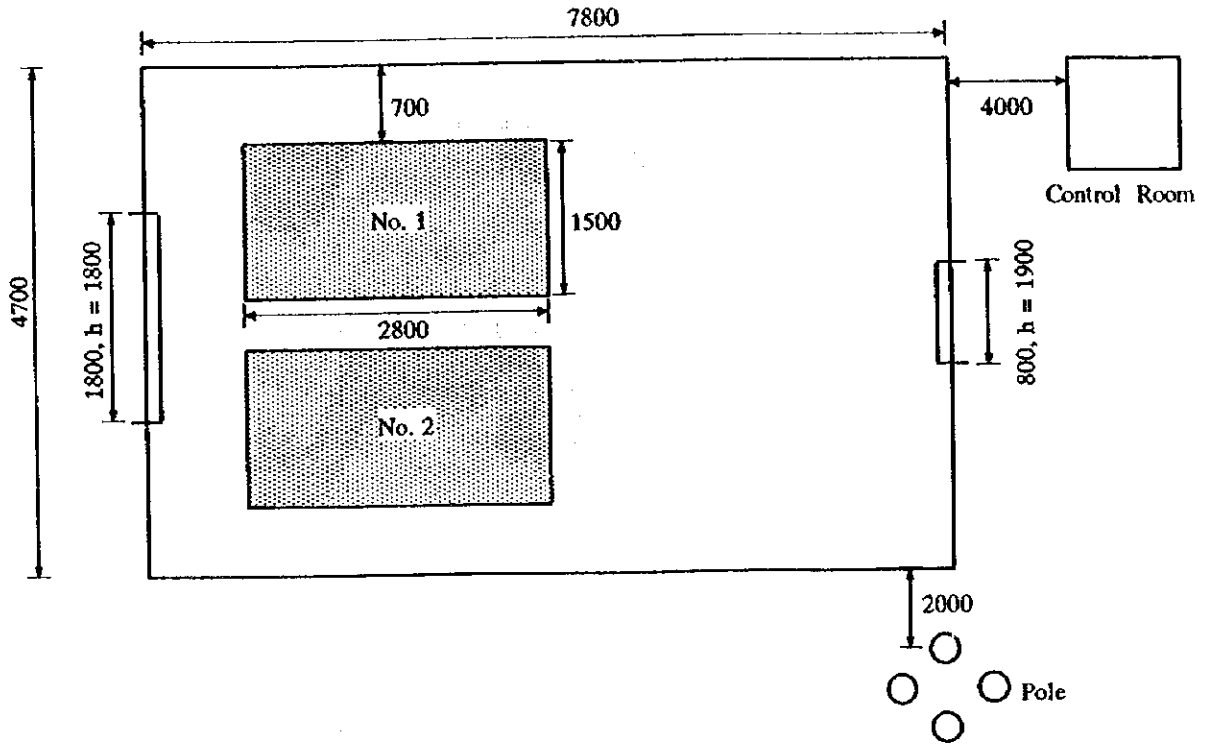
41 Layout Drawing of Khulunbuir
